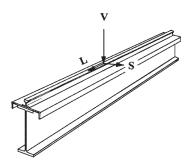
Forces acting on runway beam for top-running crane.
